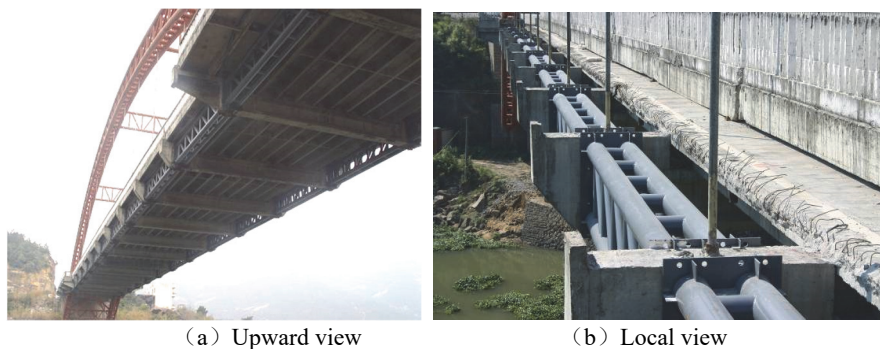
Stiffening Longitudinal Girder in Shitanxi Bridge
